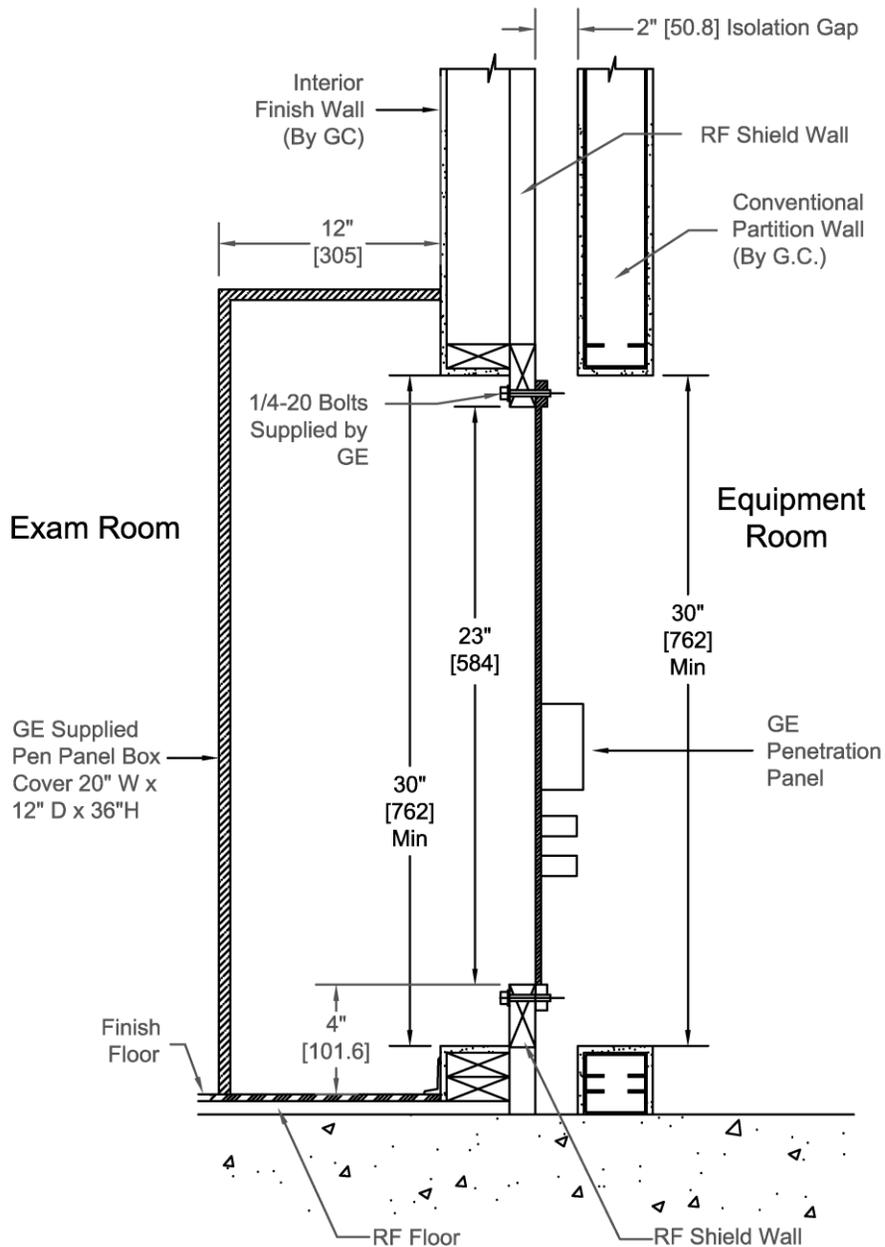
Pen Panel wall section. Typical shown. Shield wall/floor detail may vary with RF subcontractor.
